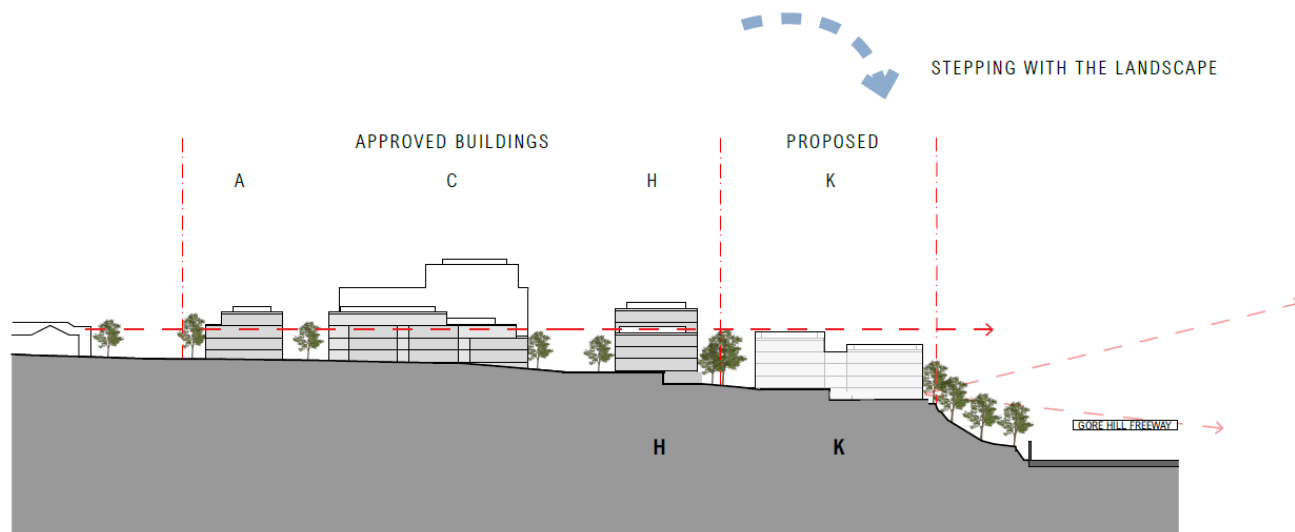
Relationship of Building K envelope to the approved Concept Plan (Section along Richmond Ave)
